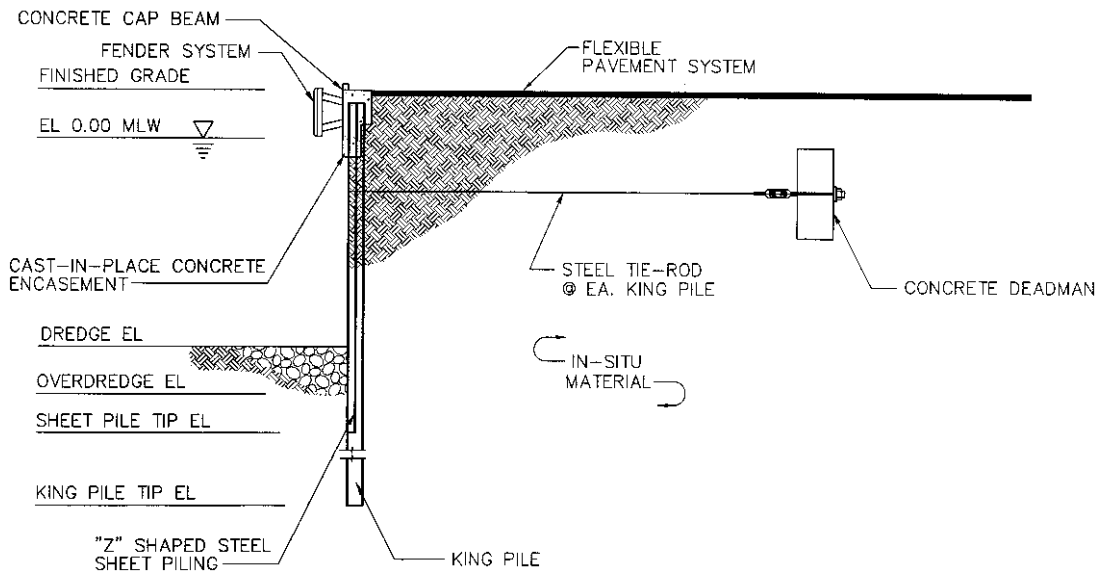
King pile bulkhead with tie-rod and deadman.
